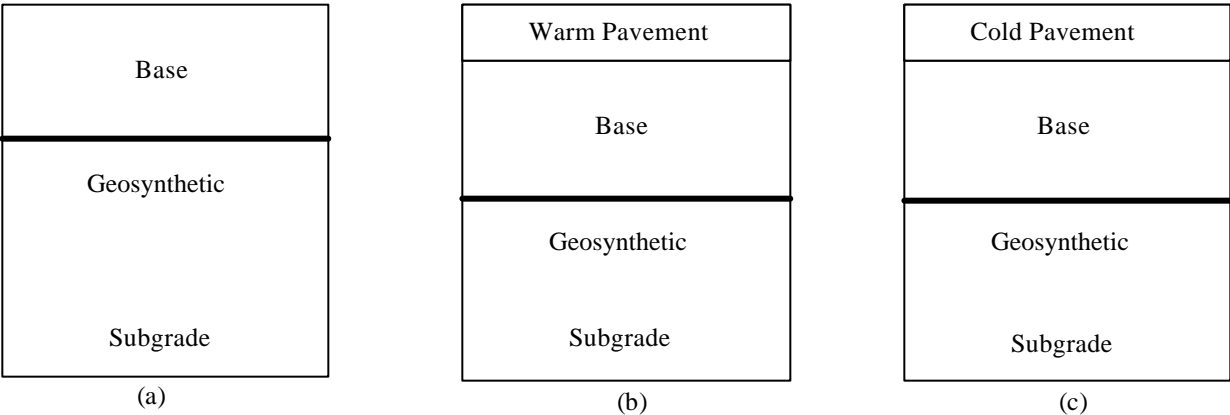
Typical road cross-sections (a) Unsurfaced, (b) Warm pavement, (c) Cold pavement
